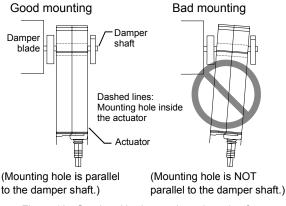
Good and bad mounting orientation for 15–85 mm long damper shaft
